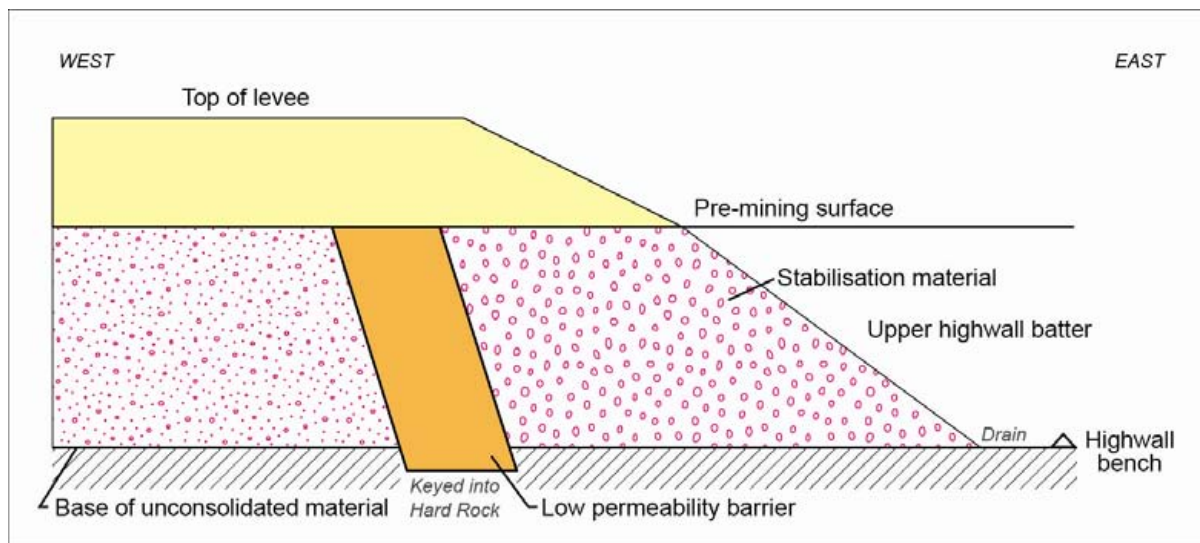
Conceptual cross-section of Western Highwall low permeability barrier and unconsolidated material stabilisation.
